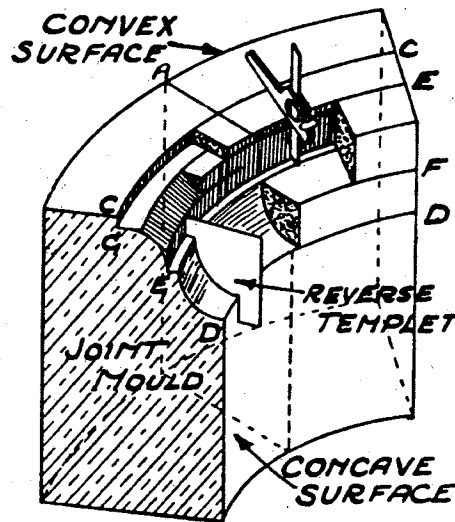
WORKING CIRCULAR MOULDINGS.
